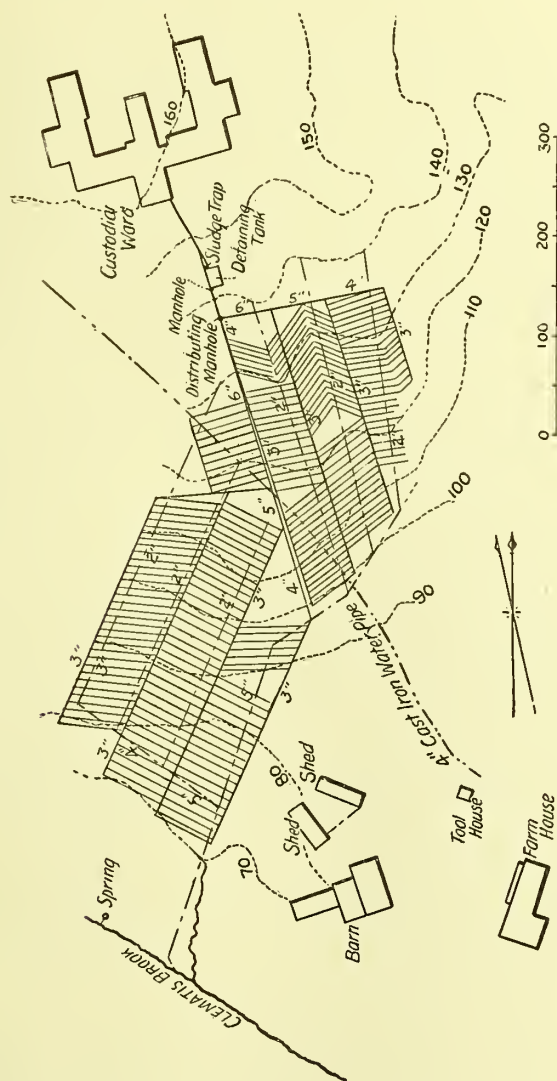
PLAN OF DISPOSAL WORKS, MASSACHUSETTS SCHOOL FOR THE FEEBLE-MINDED.
